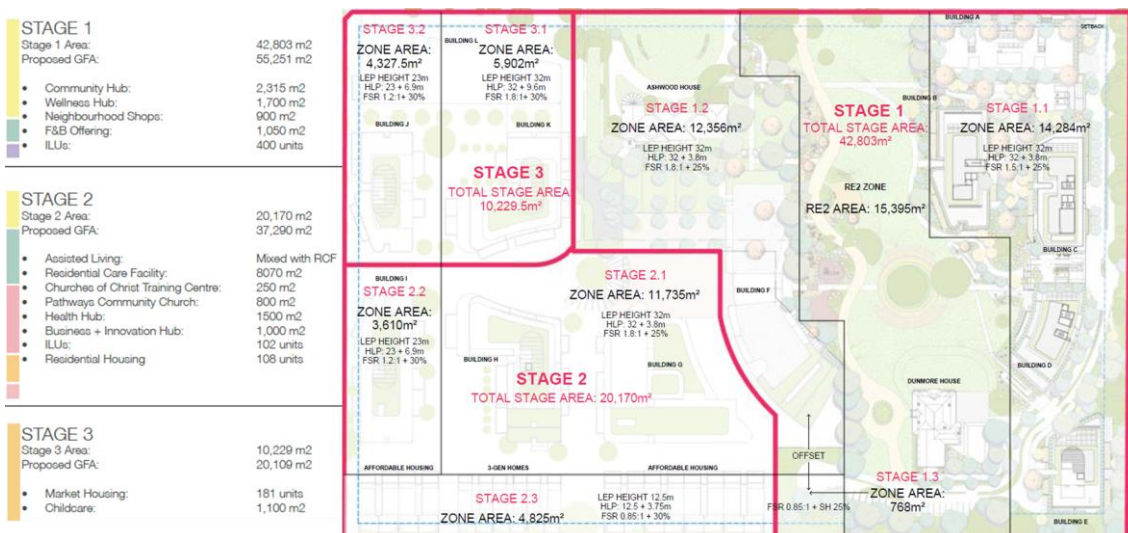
Proposed Staging Plan of the indicative Concept Master Plan (Source: Marchese Partners)
